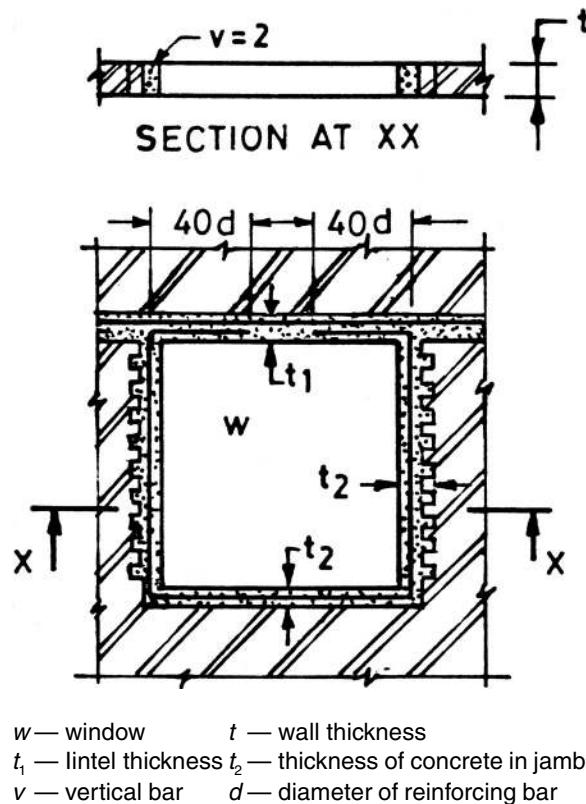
STRENGTHENING MASONRY AROUND OPENINGS
